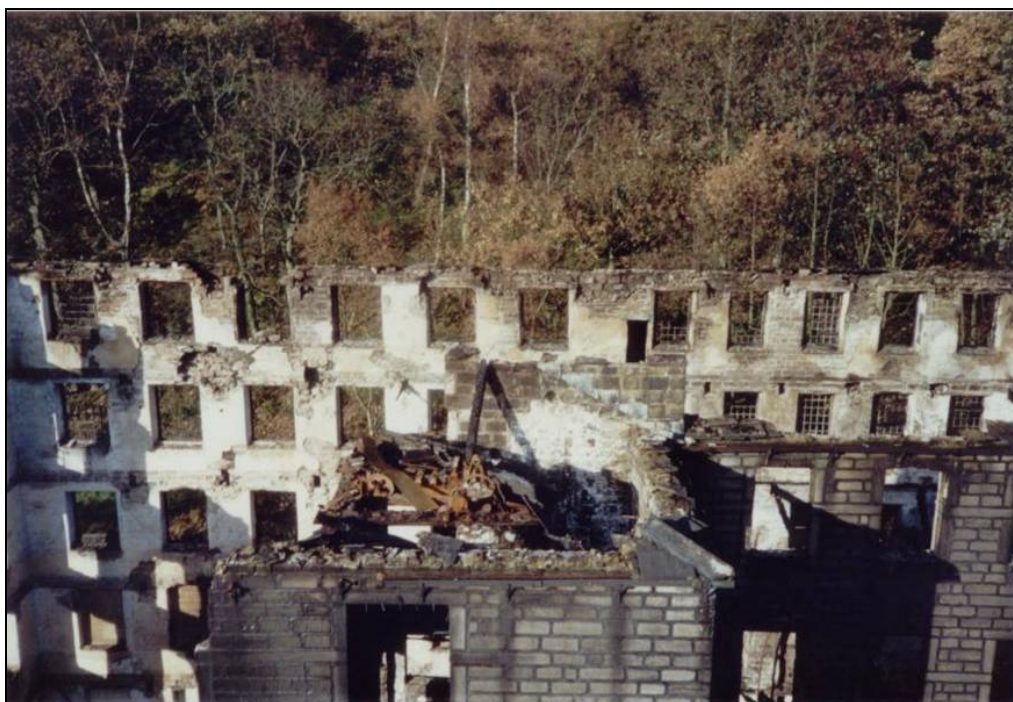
Interior south facing elevations of building 5 & 6, showing difference in size of windows (© David Brown1989)
